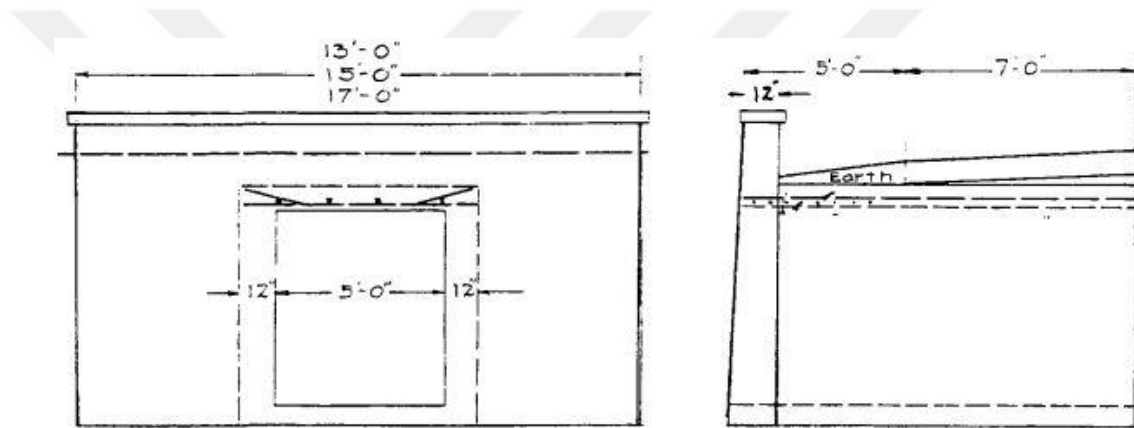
“Steel-concrete” box culvert, 1912 Standard Plans (Maryland Department of Transportation, 1997).
